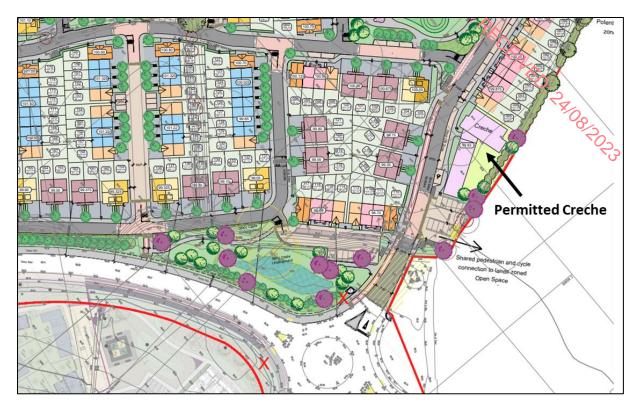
Extract from site layout submitted with Phase 3 application showing permitted creche location.
